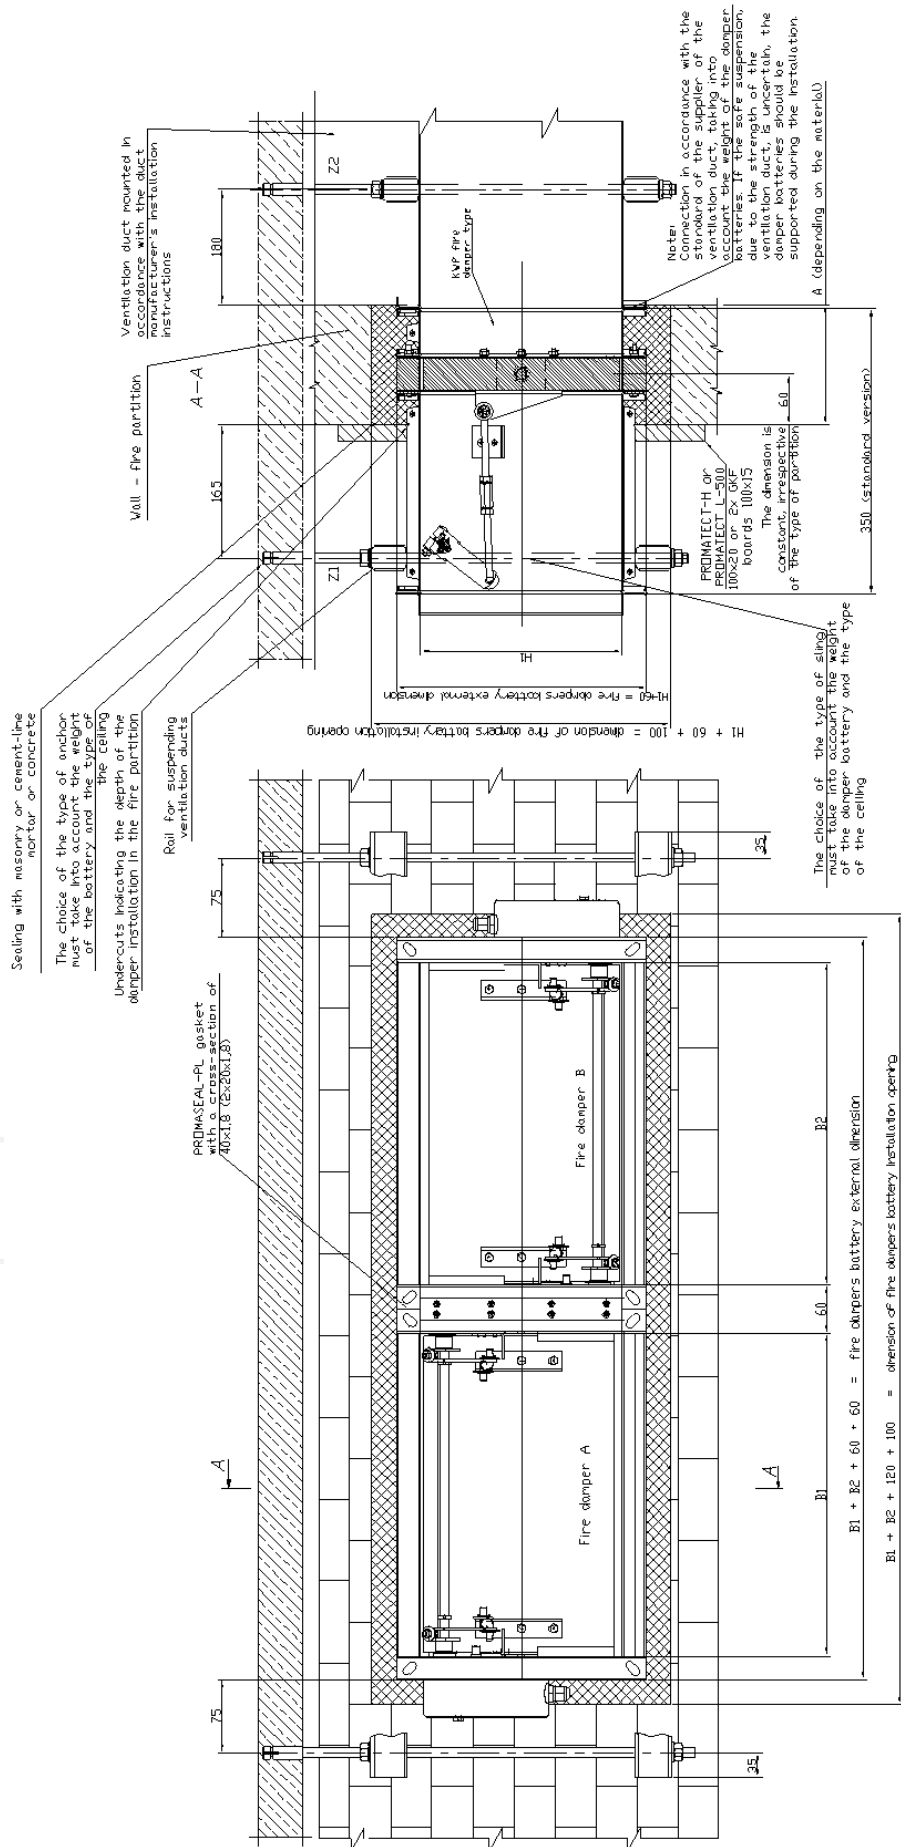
Installation of battery consisting of two smoke control dampers KWP-P in horizontal arrangement in wall
